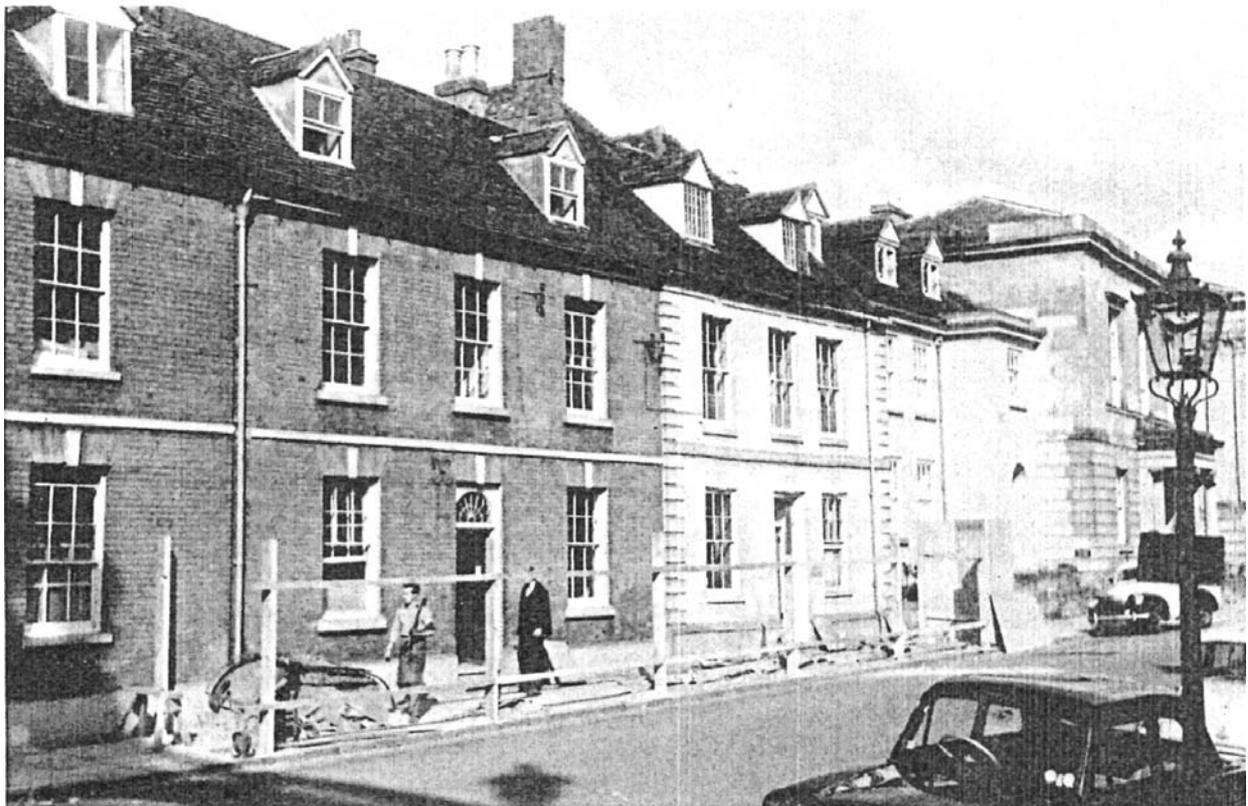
Nos 3 and 5 Northgate Street during demolition, August 1962, with the 1955 extension (set back) and the Judges House to the right (WRO PH 143/861)
